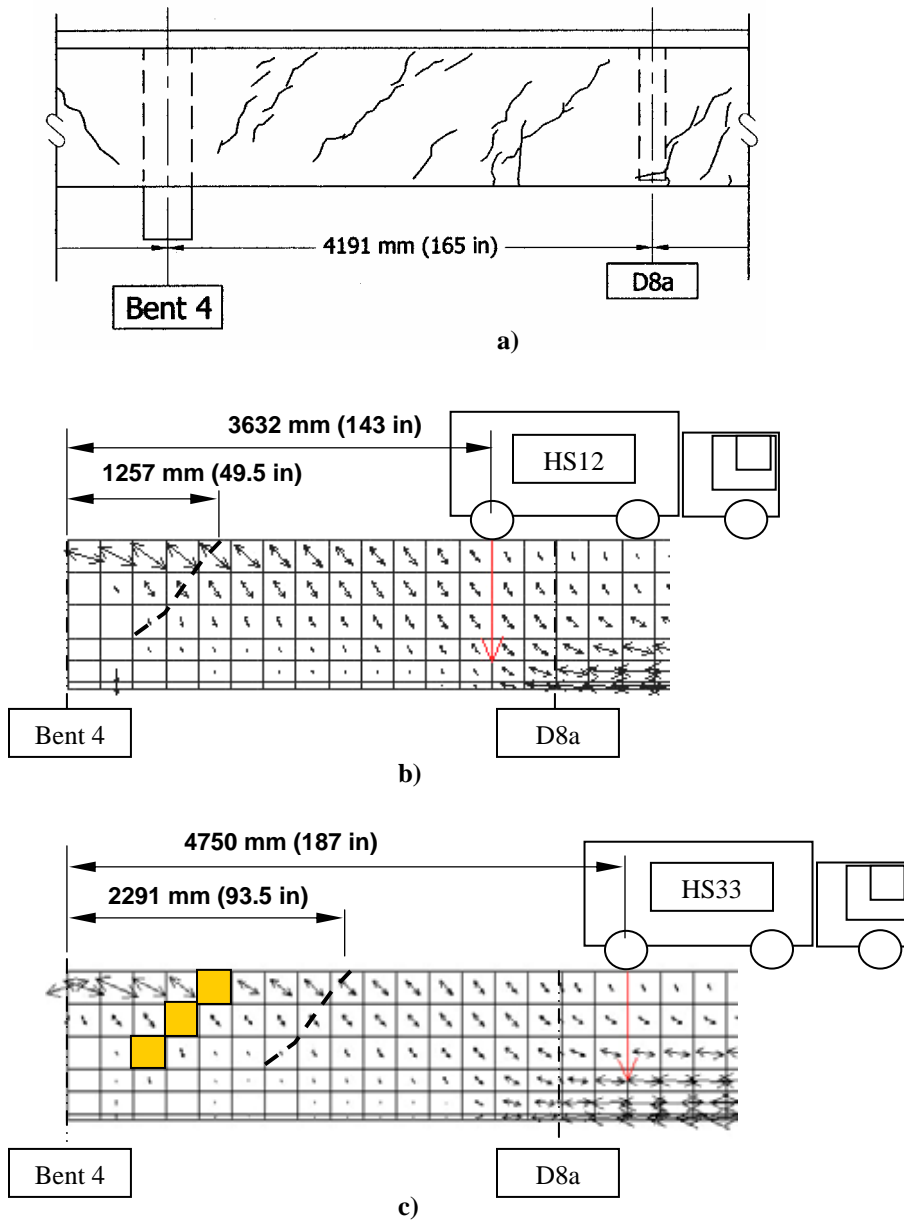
Diagonal-tension cracking prediction using finite element analyses – a) crack pattern existing in the bridge exterior girder; b) first cracking prediction; c) second cracking prediction
